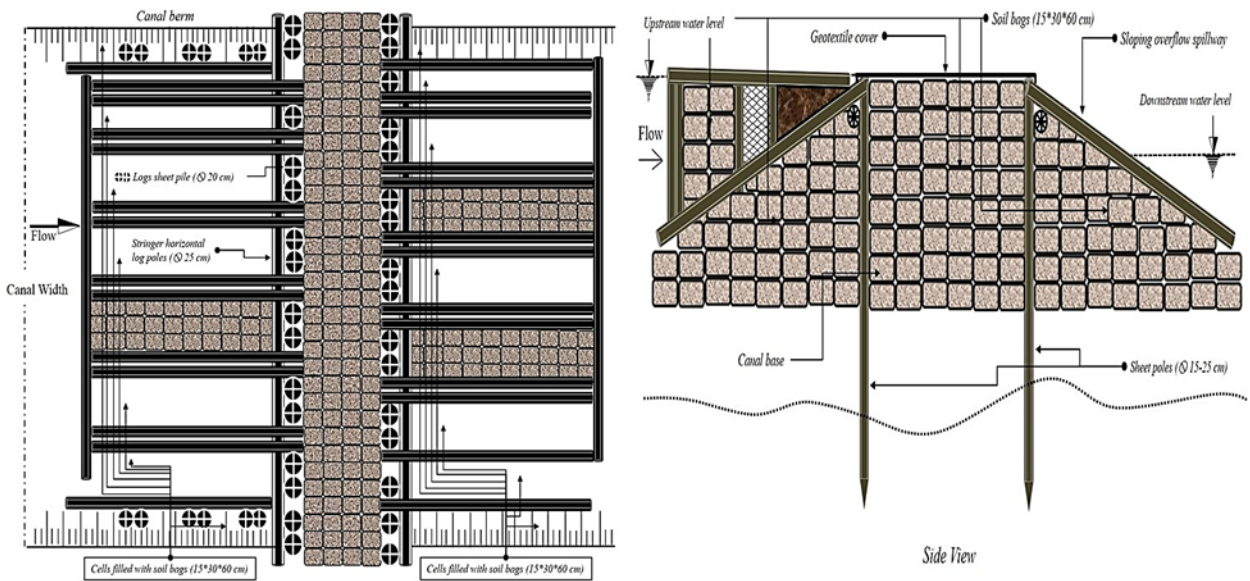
Two sheet pile box dam equipped with inclined overflow spillway (CCFPI Dam Model 3)
